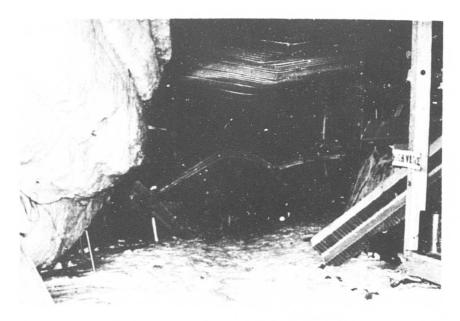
The floor and end wall panels of this plastic building known as the CRREL Lab were removed in 1966 to allow the removal of drilling equipment from the rear of Trench 12. The wall-roof panels later collapsed under excessive snow loading.
